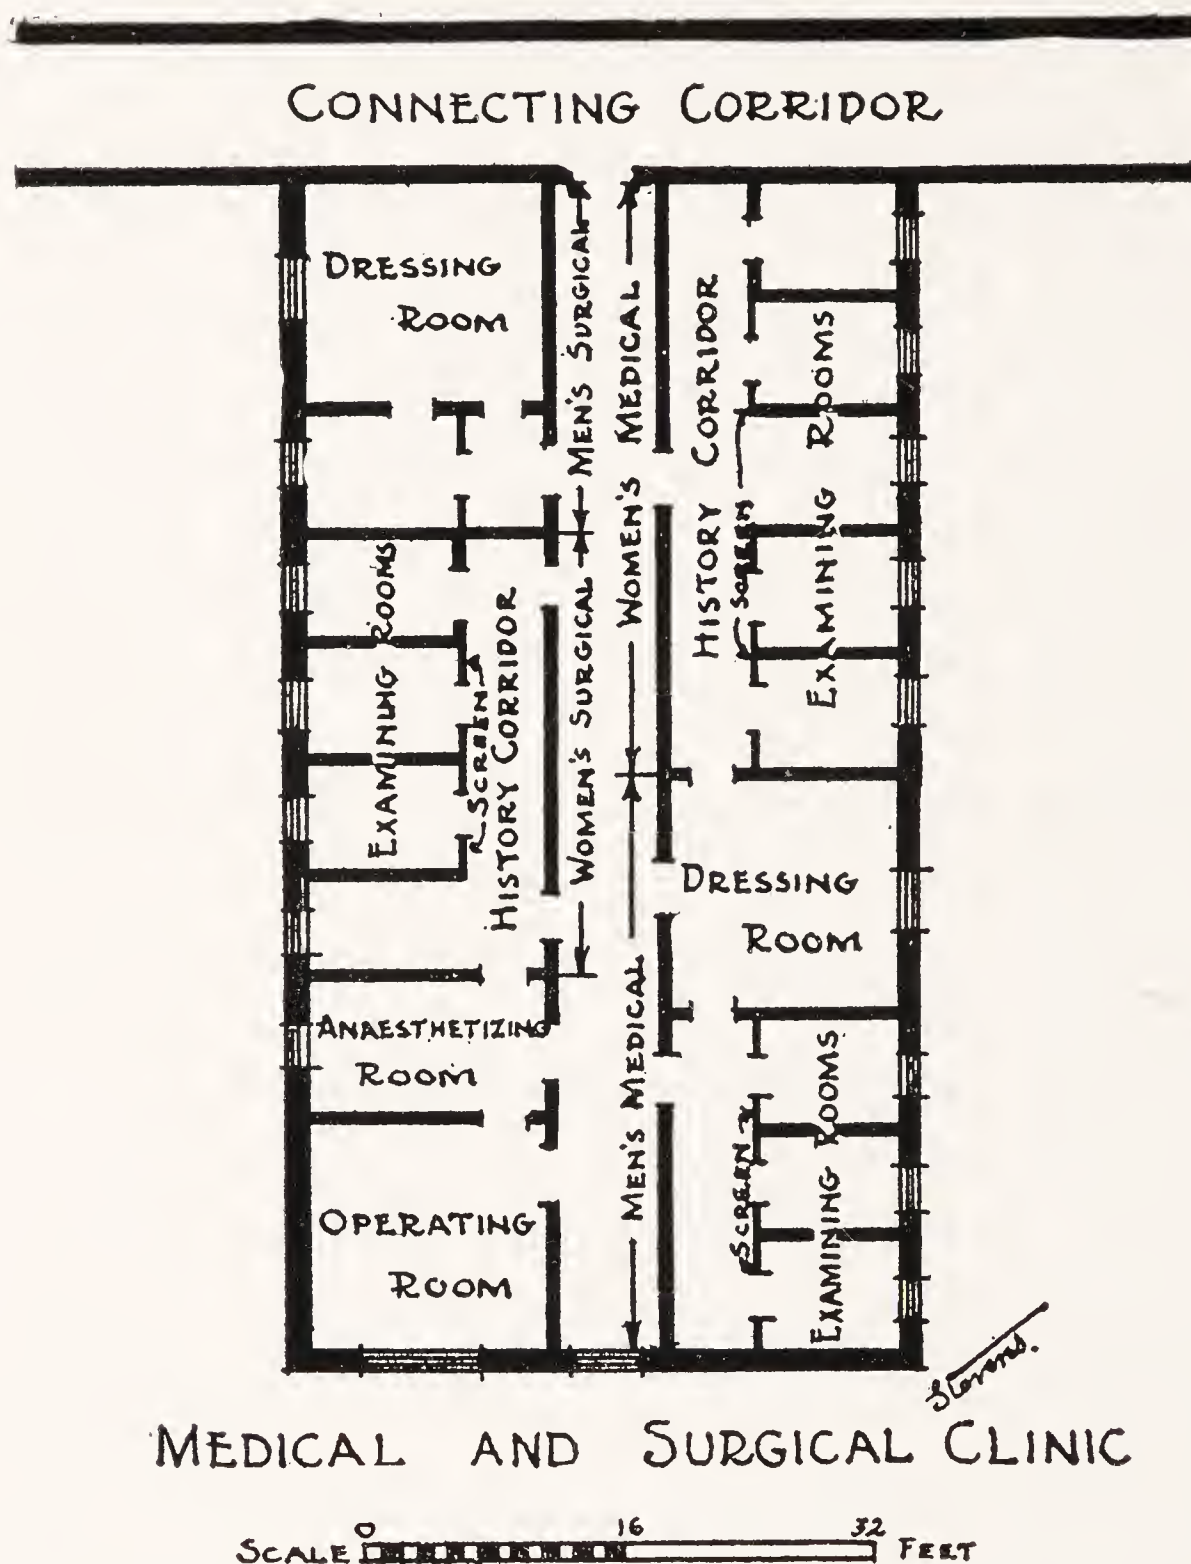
LONG, RECTANGULAR BUILDING FOR OUT-PATIENT DEPARTMENT
